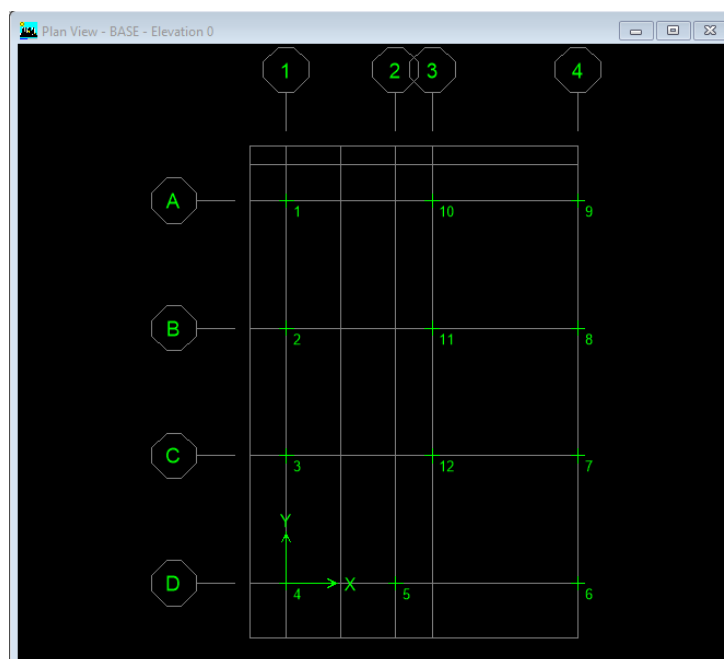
Foundation plan of the G+1 Building (Habibullah, 1995)
